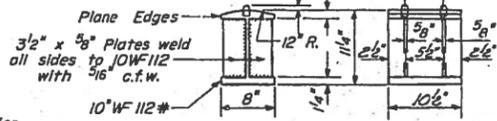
DETAIL OF BEARING AT PIERS 1, 3 & ABUT.
